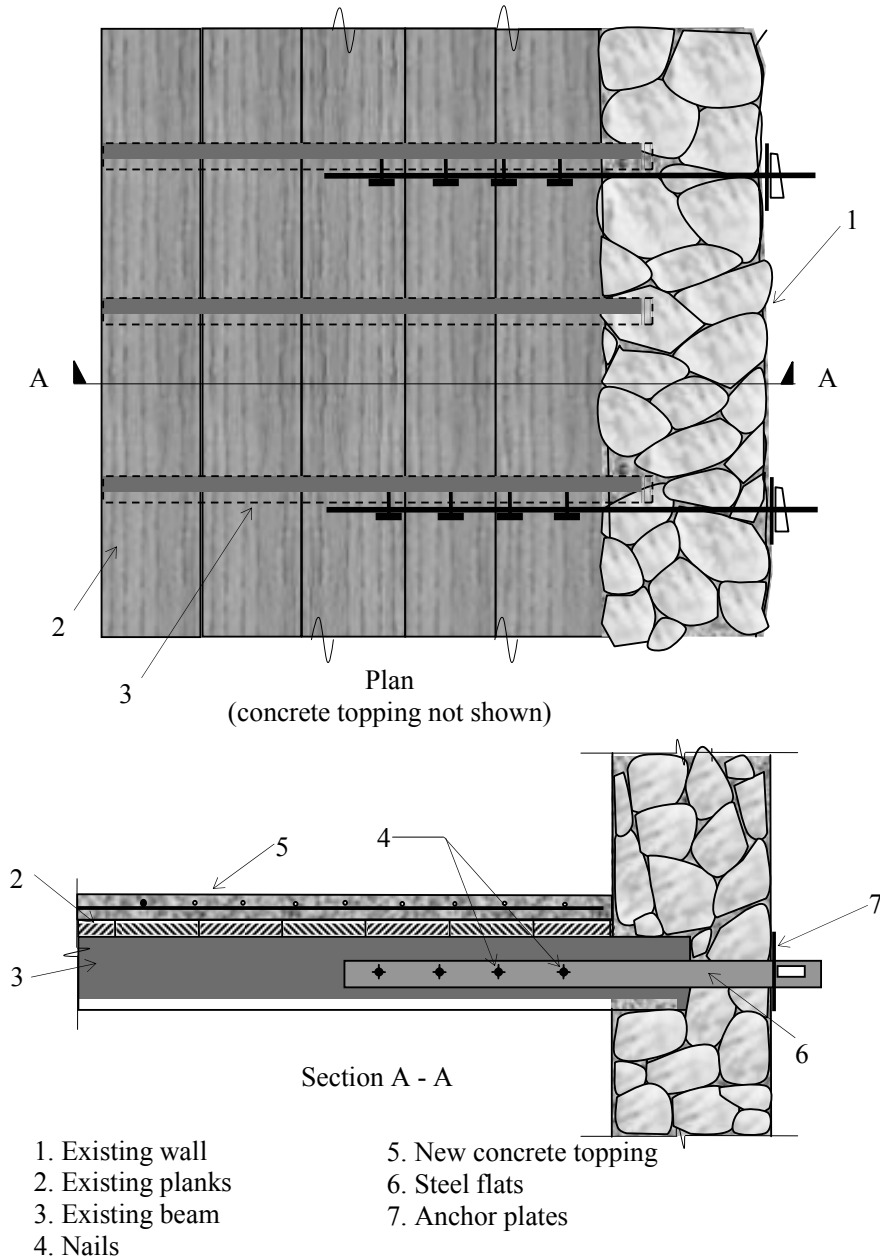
Connection of floor to wall (beams perpendicular to wall)
